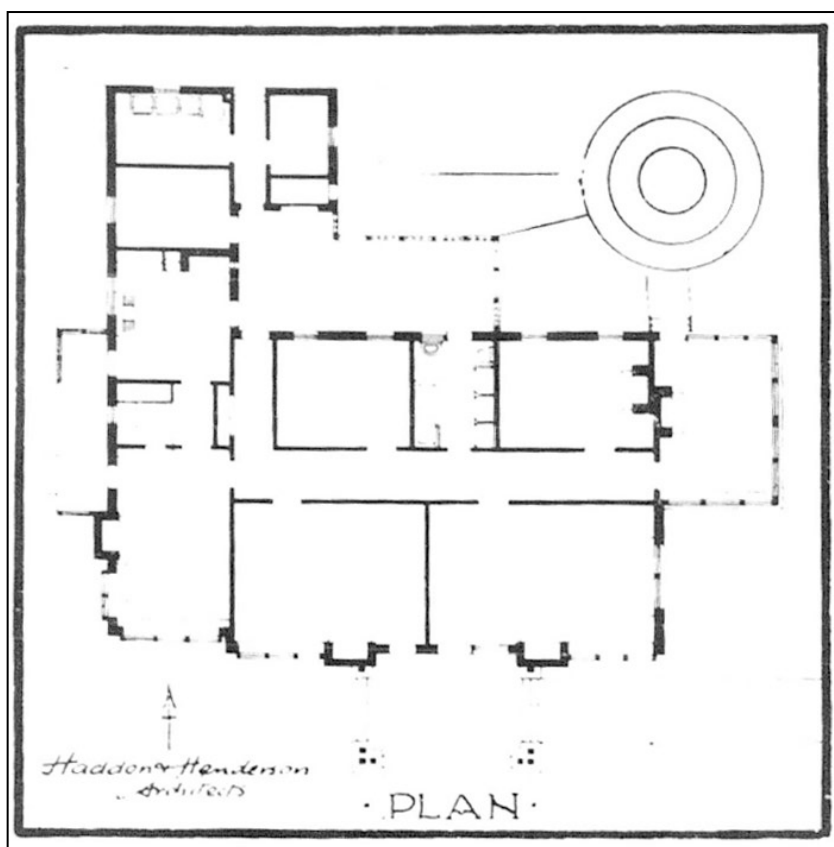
Plan of the house by architects Haddon & Henderson, published 1924 (*Australian Home Builder*, 15 Dec 1924:63).
